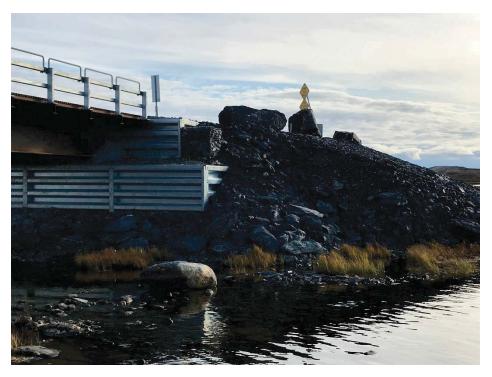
M-5 Bridge at KM10.5, photo of the bridge and the Left (north) Abutment from the upstream side of the Right (south) Abutment (13 September 2018)
